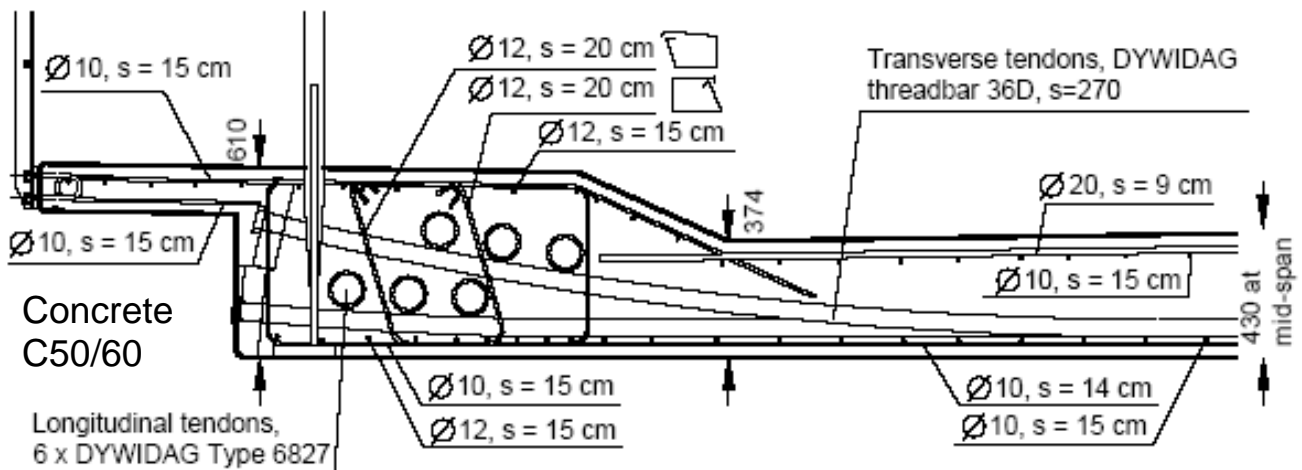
Reinforcement of the tie of a railway bridge spanning 100 m.
